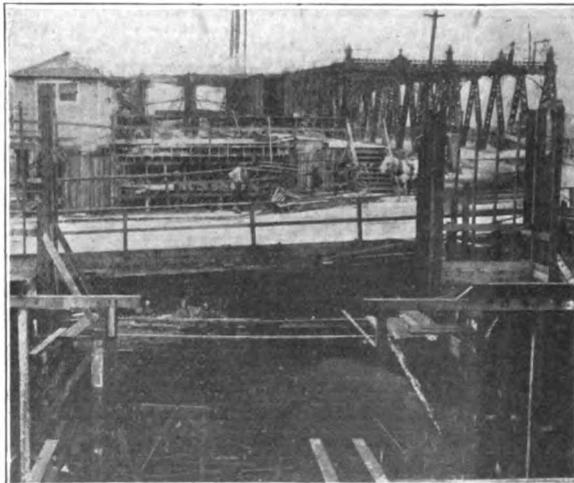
Present Conclusion of Roosevelt Road, Concrete Is Completed up to the Girders.
